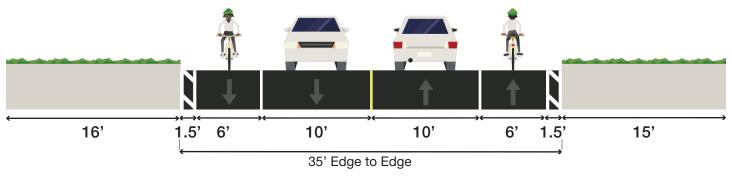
Existing Condition 116th Street, Big Marsh Park to Torrence Avenue
